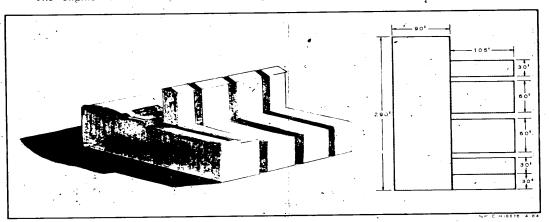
PLAN AND PERSPECTIVE VIEWS OF ENGINE TEST BUILDING, WU-KUNG AIRCRAFT ENGINE PLANT.
